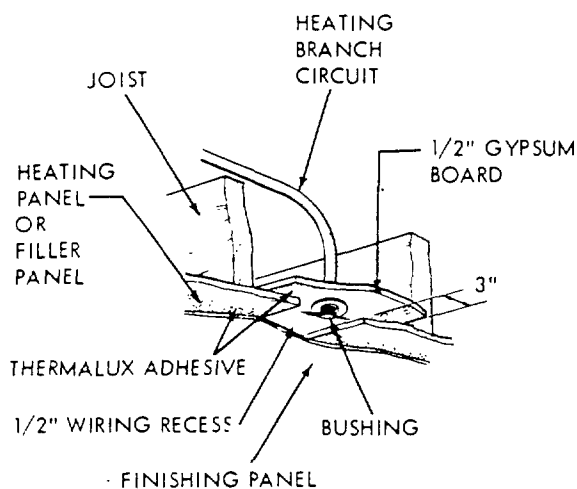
Wiring Recess Construction (1/2" Depth)
